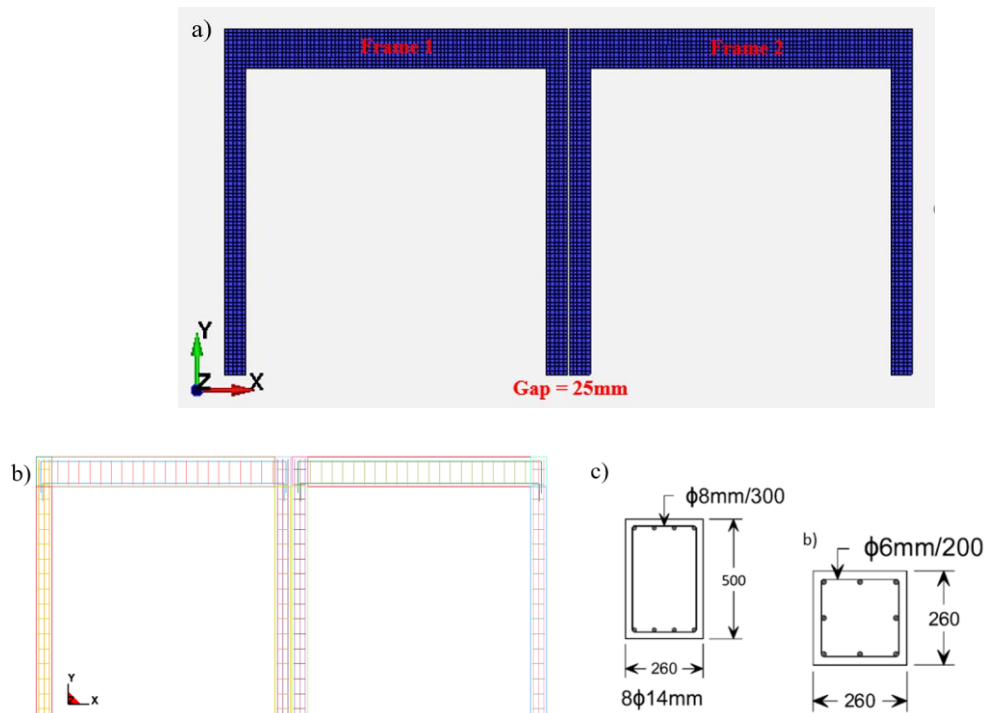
(a) geometry of two adjacent one-storey buildings with 25mm gap in between, (b) frame reinforcement constructed in LS-DYNA, (c) drawings of the reinforcement detailing (Garcia et al. 2010)
